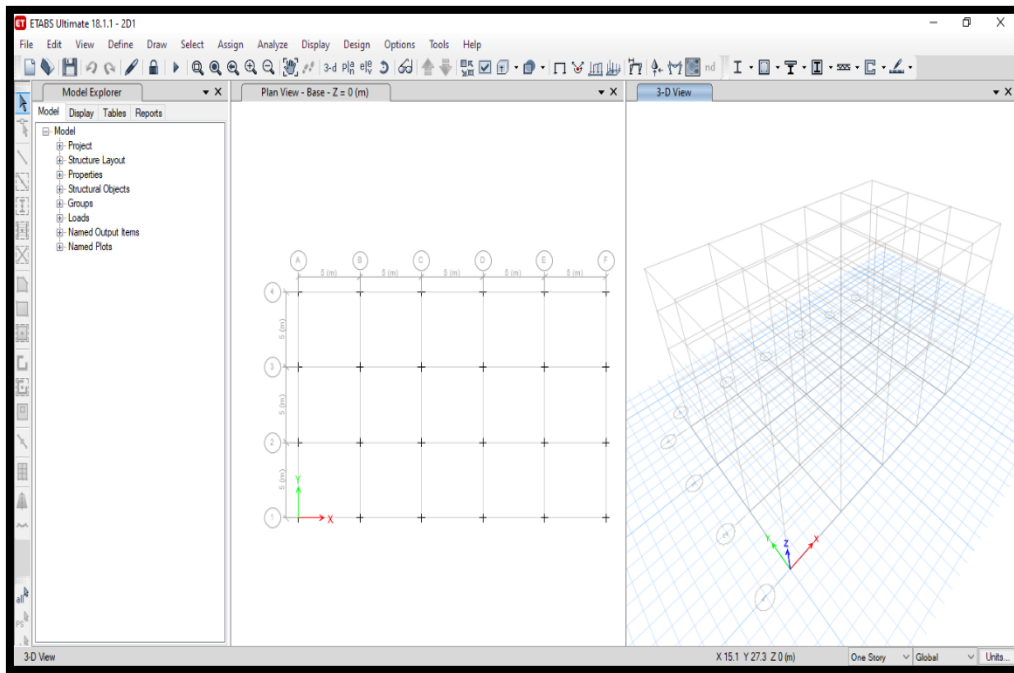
Plan and 3D configuration of building for G+3 Building
